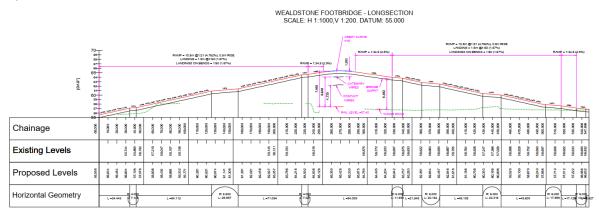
Proposed Structure Plan A Vertical Profile - Walkway/Cycleway
